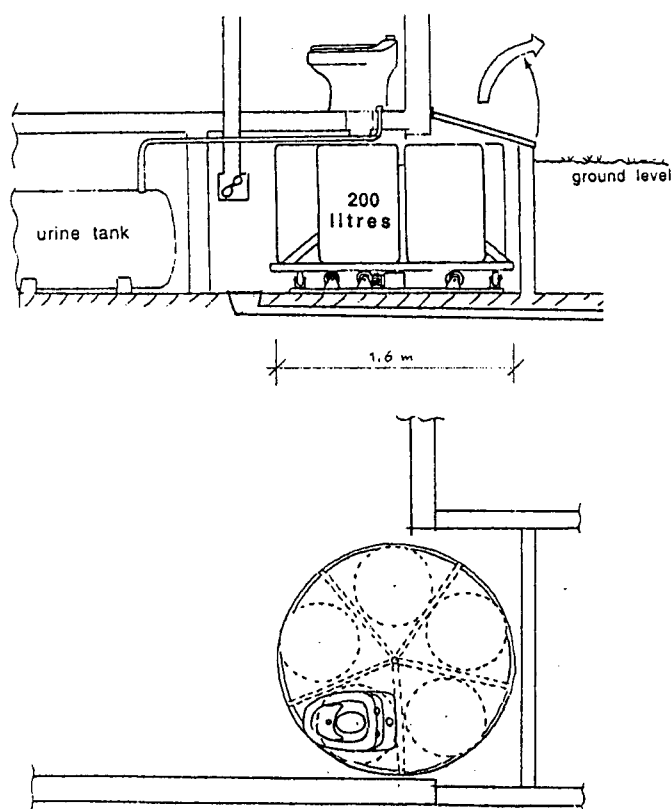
Section and plan of staff toilet at the Bergianska Botanical Garden
